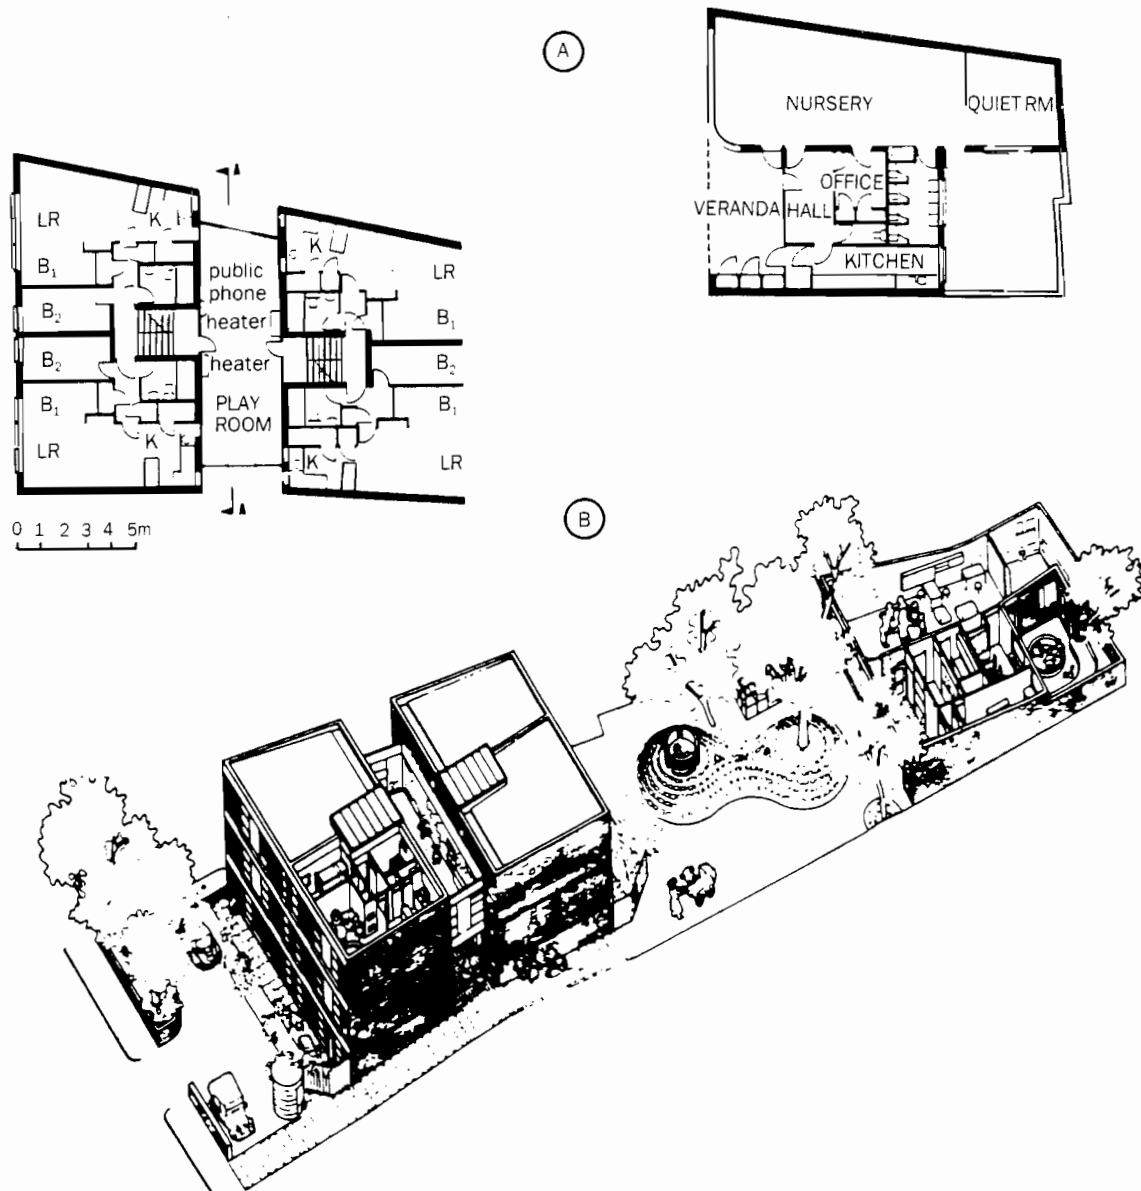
A, Fiona House, second-floor plan, main building, showing corridor used as a playroom, with kitchen windows opening into it; first-floor plan, rear building, showing nursery school. B, Axonometric drawing, Fiona House, Nina West Homes, London, 1972, designed by Sylvester Bone. Twelve two-bedroom units for divorced or separated mothers with additional outdoor play space and neighborhood nursery school facility. Flats can be linked by intercom system to provide an audio substitute for babysitting
